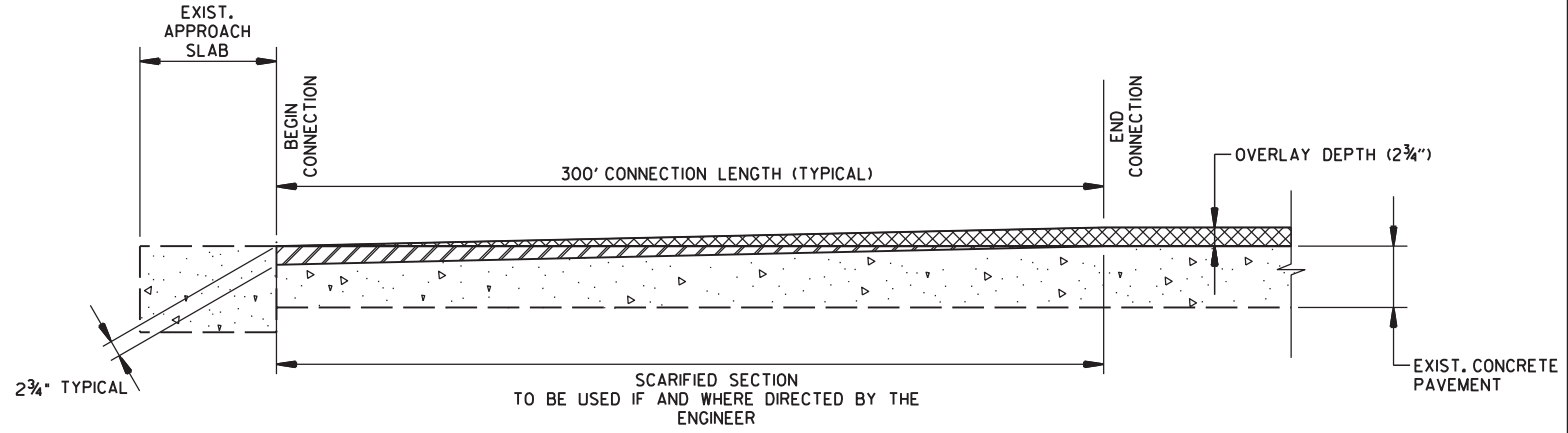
DETAIL FOR EXISTING CONCRETE PAVEMENT TRANSITIONS AT BRIDGE LOCATIONS
